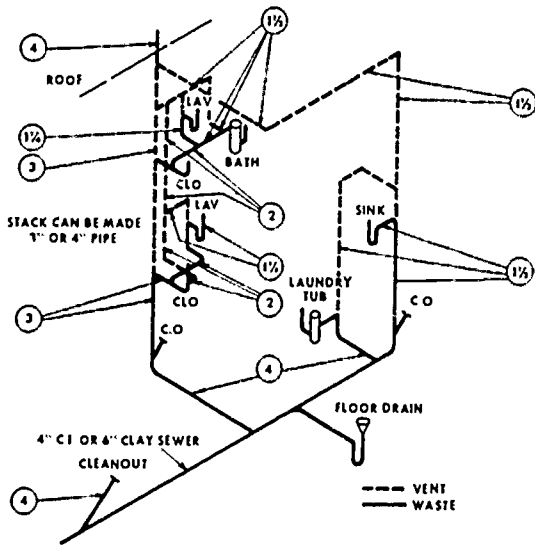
Plumbing layout for a two-story residence, showing individual ventilation of fixtures
